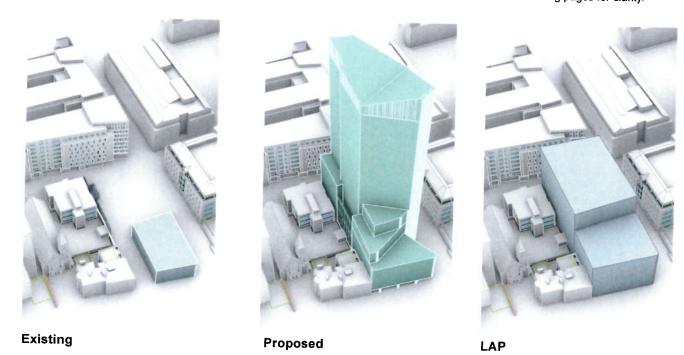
Image of assessment mode for existing, proposed 24 storey and 8/11 Storey buildings
